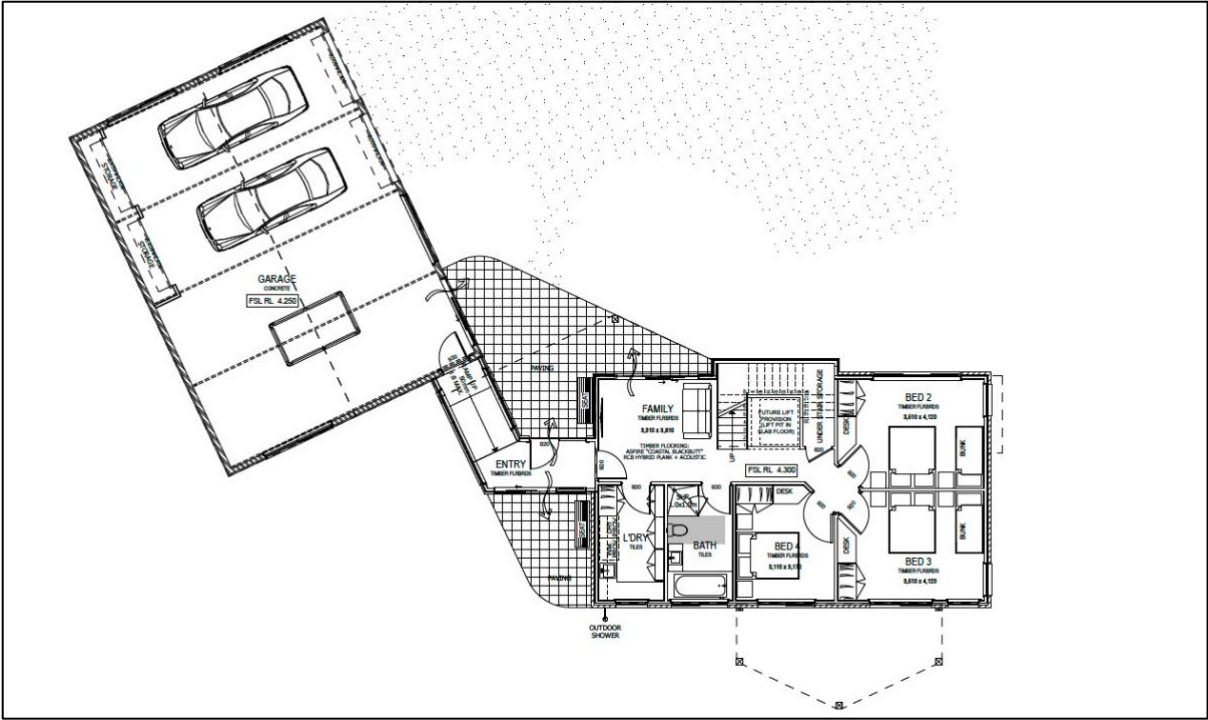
Proposed ground floor plan by Peter Jackson Pty. Ltd.
